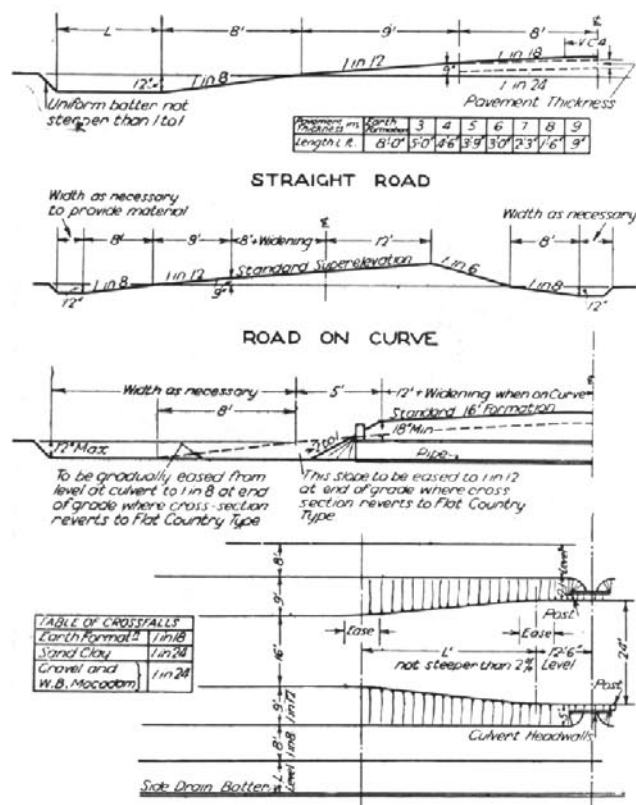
Standard typical cross section, Type A, for use in flat country subject to slight inundation.
